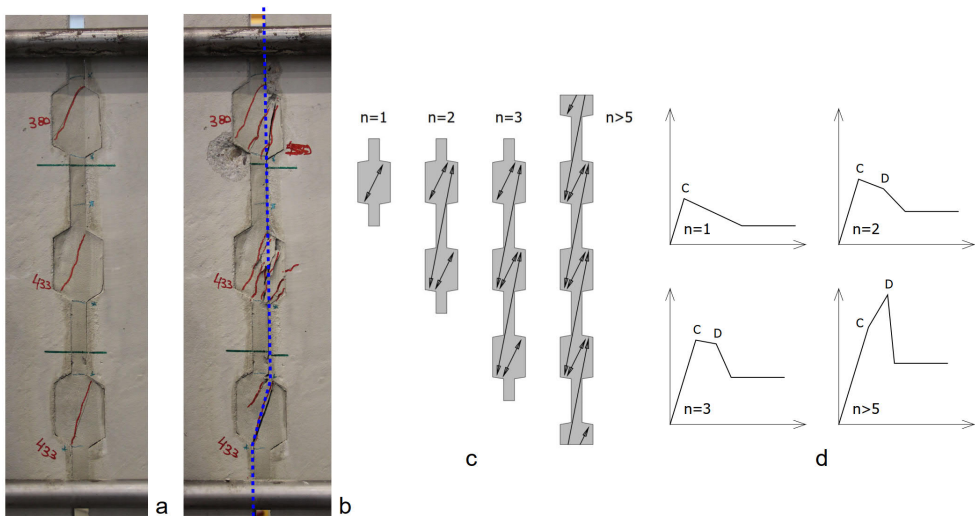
Structural behaviour of the Aligned shear key connection (Specimen 1-3)
